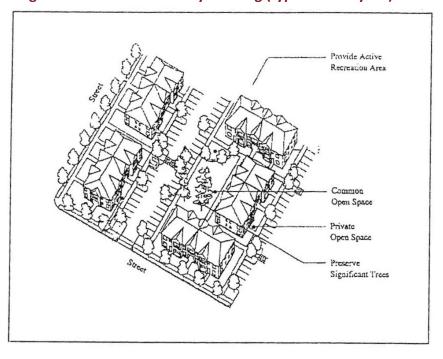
600 - Multifamily Housing (typical site layout)
